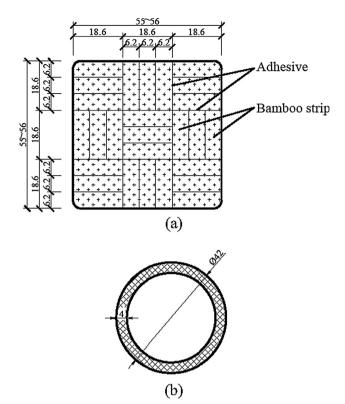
Configurations of the space truss members: (a) glubam coupon; (b) steel coupon (unit: mm).
